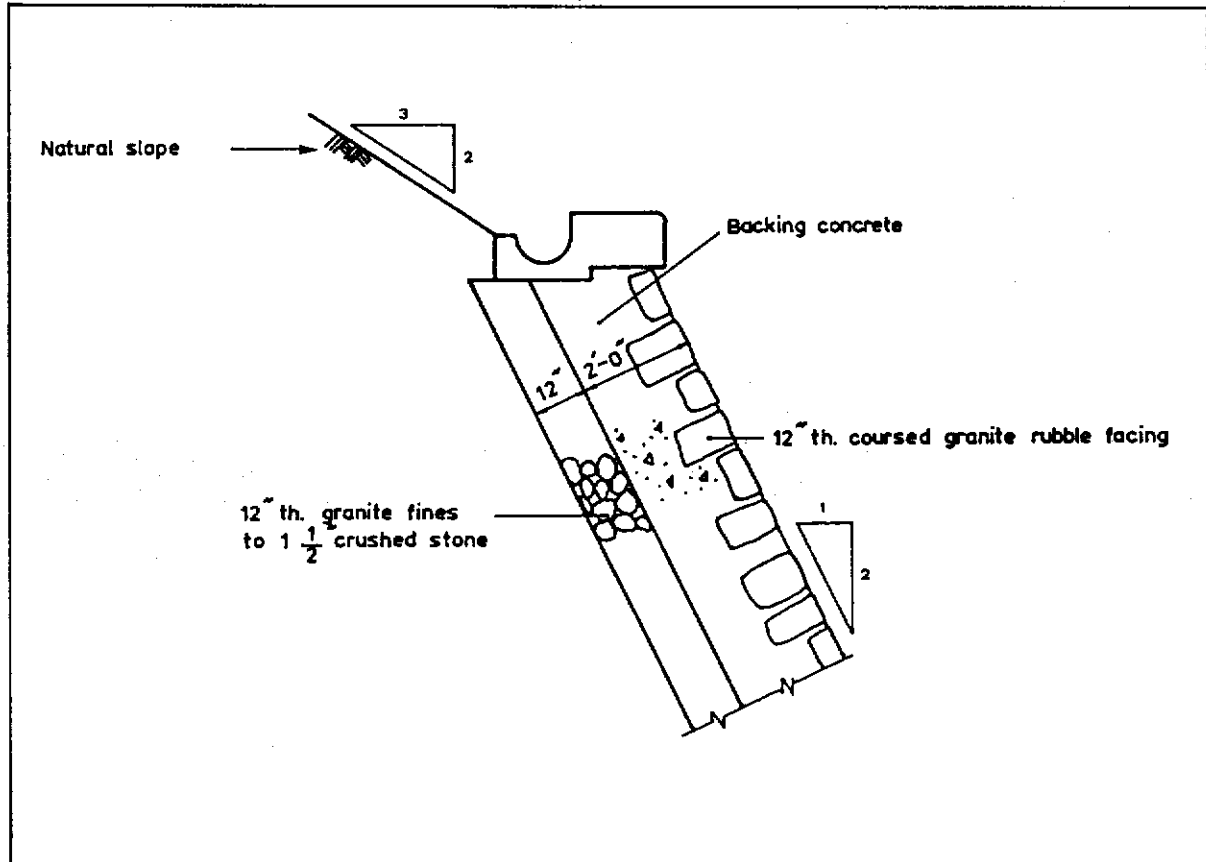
Section of Stone Pitching at Slope 11SW-B/CR16
